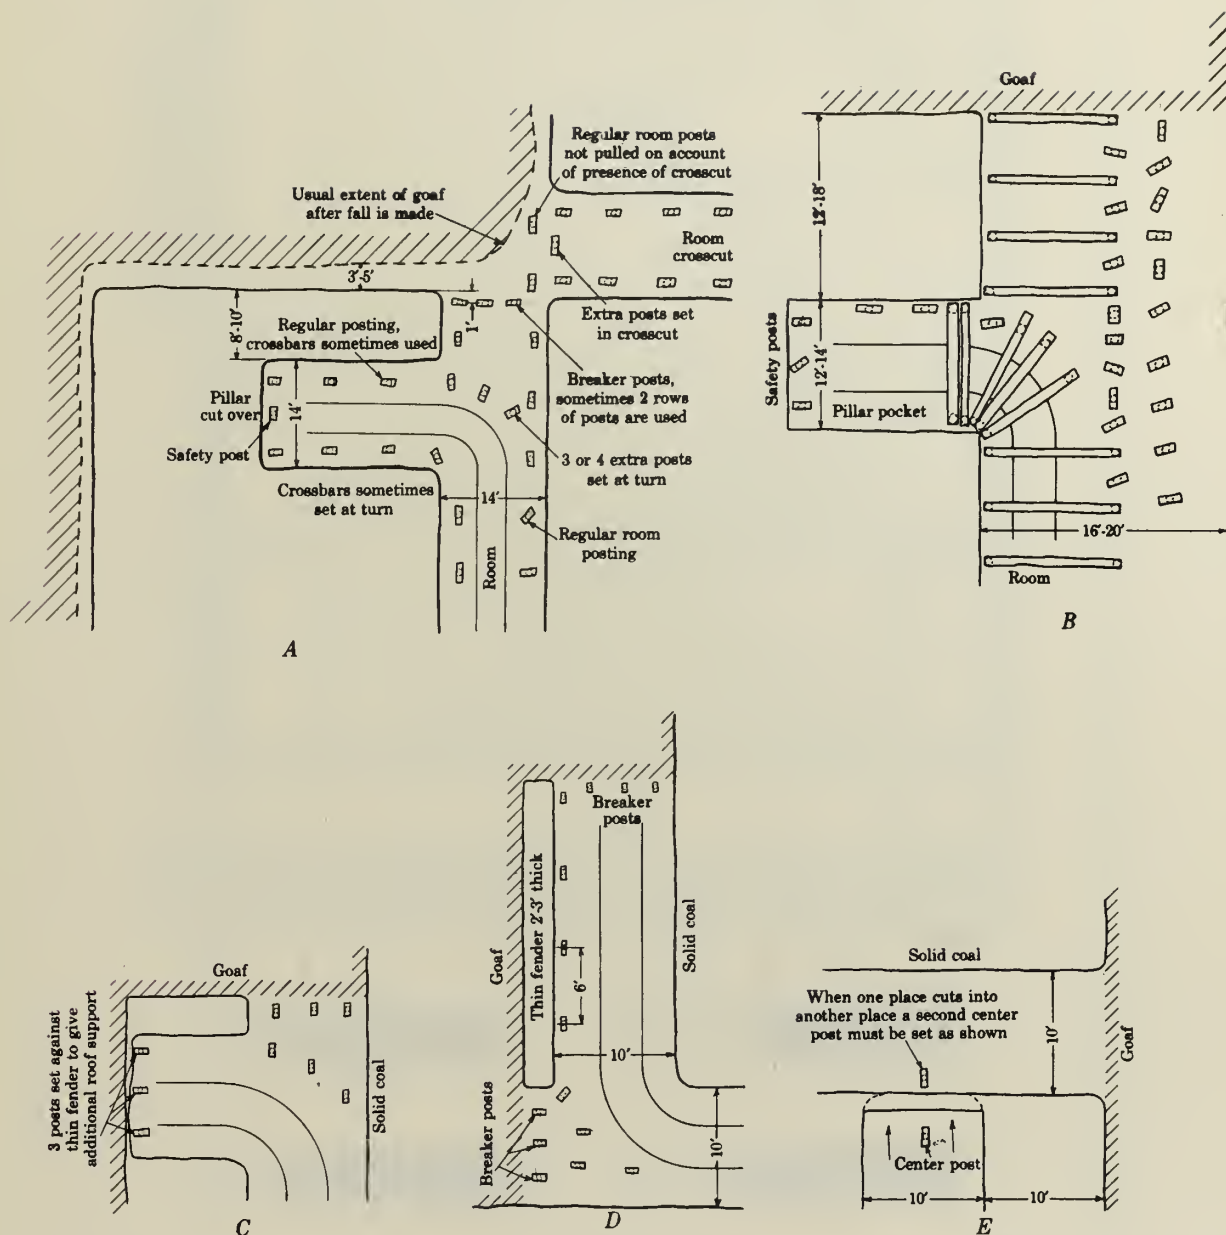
Details of timbering in pillar work, group C, type E mines: A, Timbering in pillar places using posts only; B, timbering with crossbars and posts in pillar places; C, details of pillar timbering at goaf line; D, details of pillar timbering with thin fenders; E, details of pillar timbering when cutting into adjoining room.
